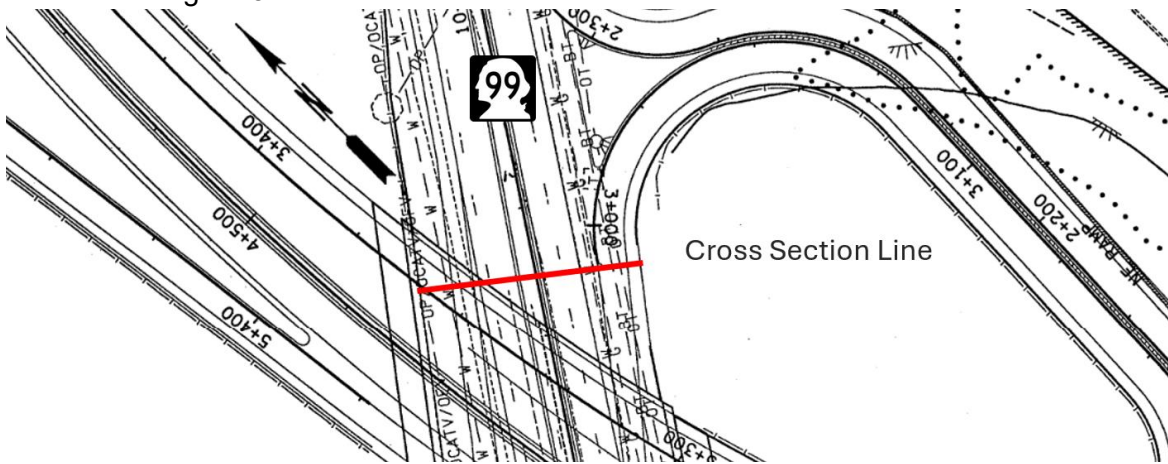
Cross section line across SR 99 under the SR 525 bridge. WSDOT.
